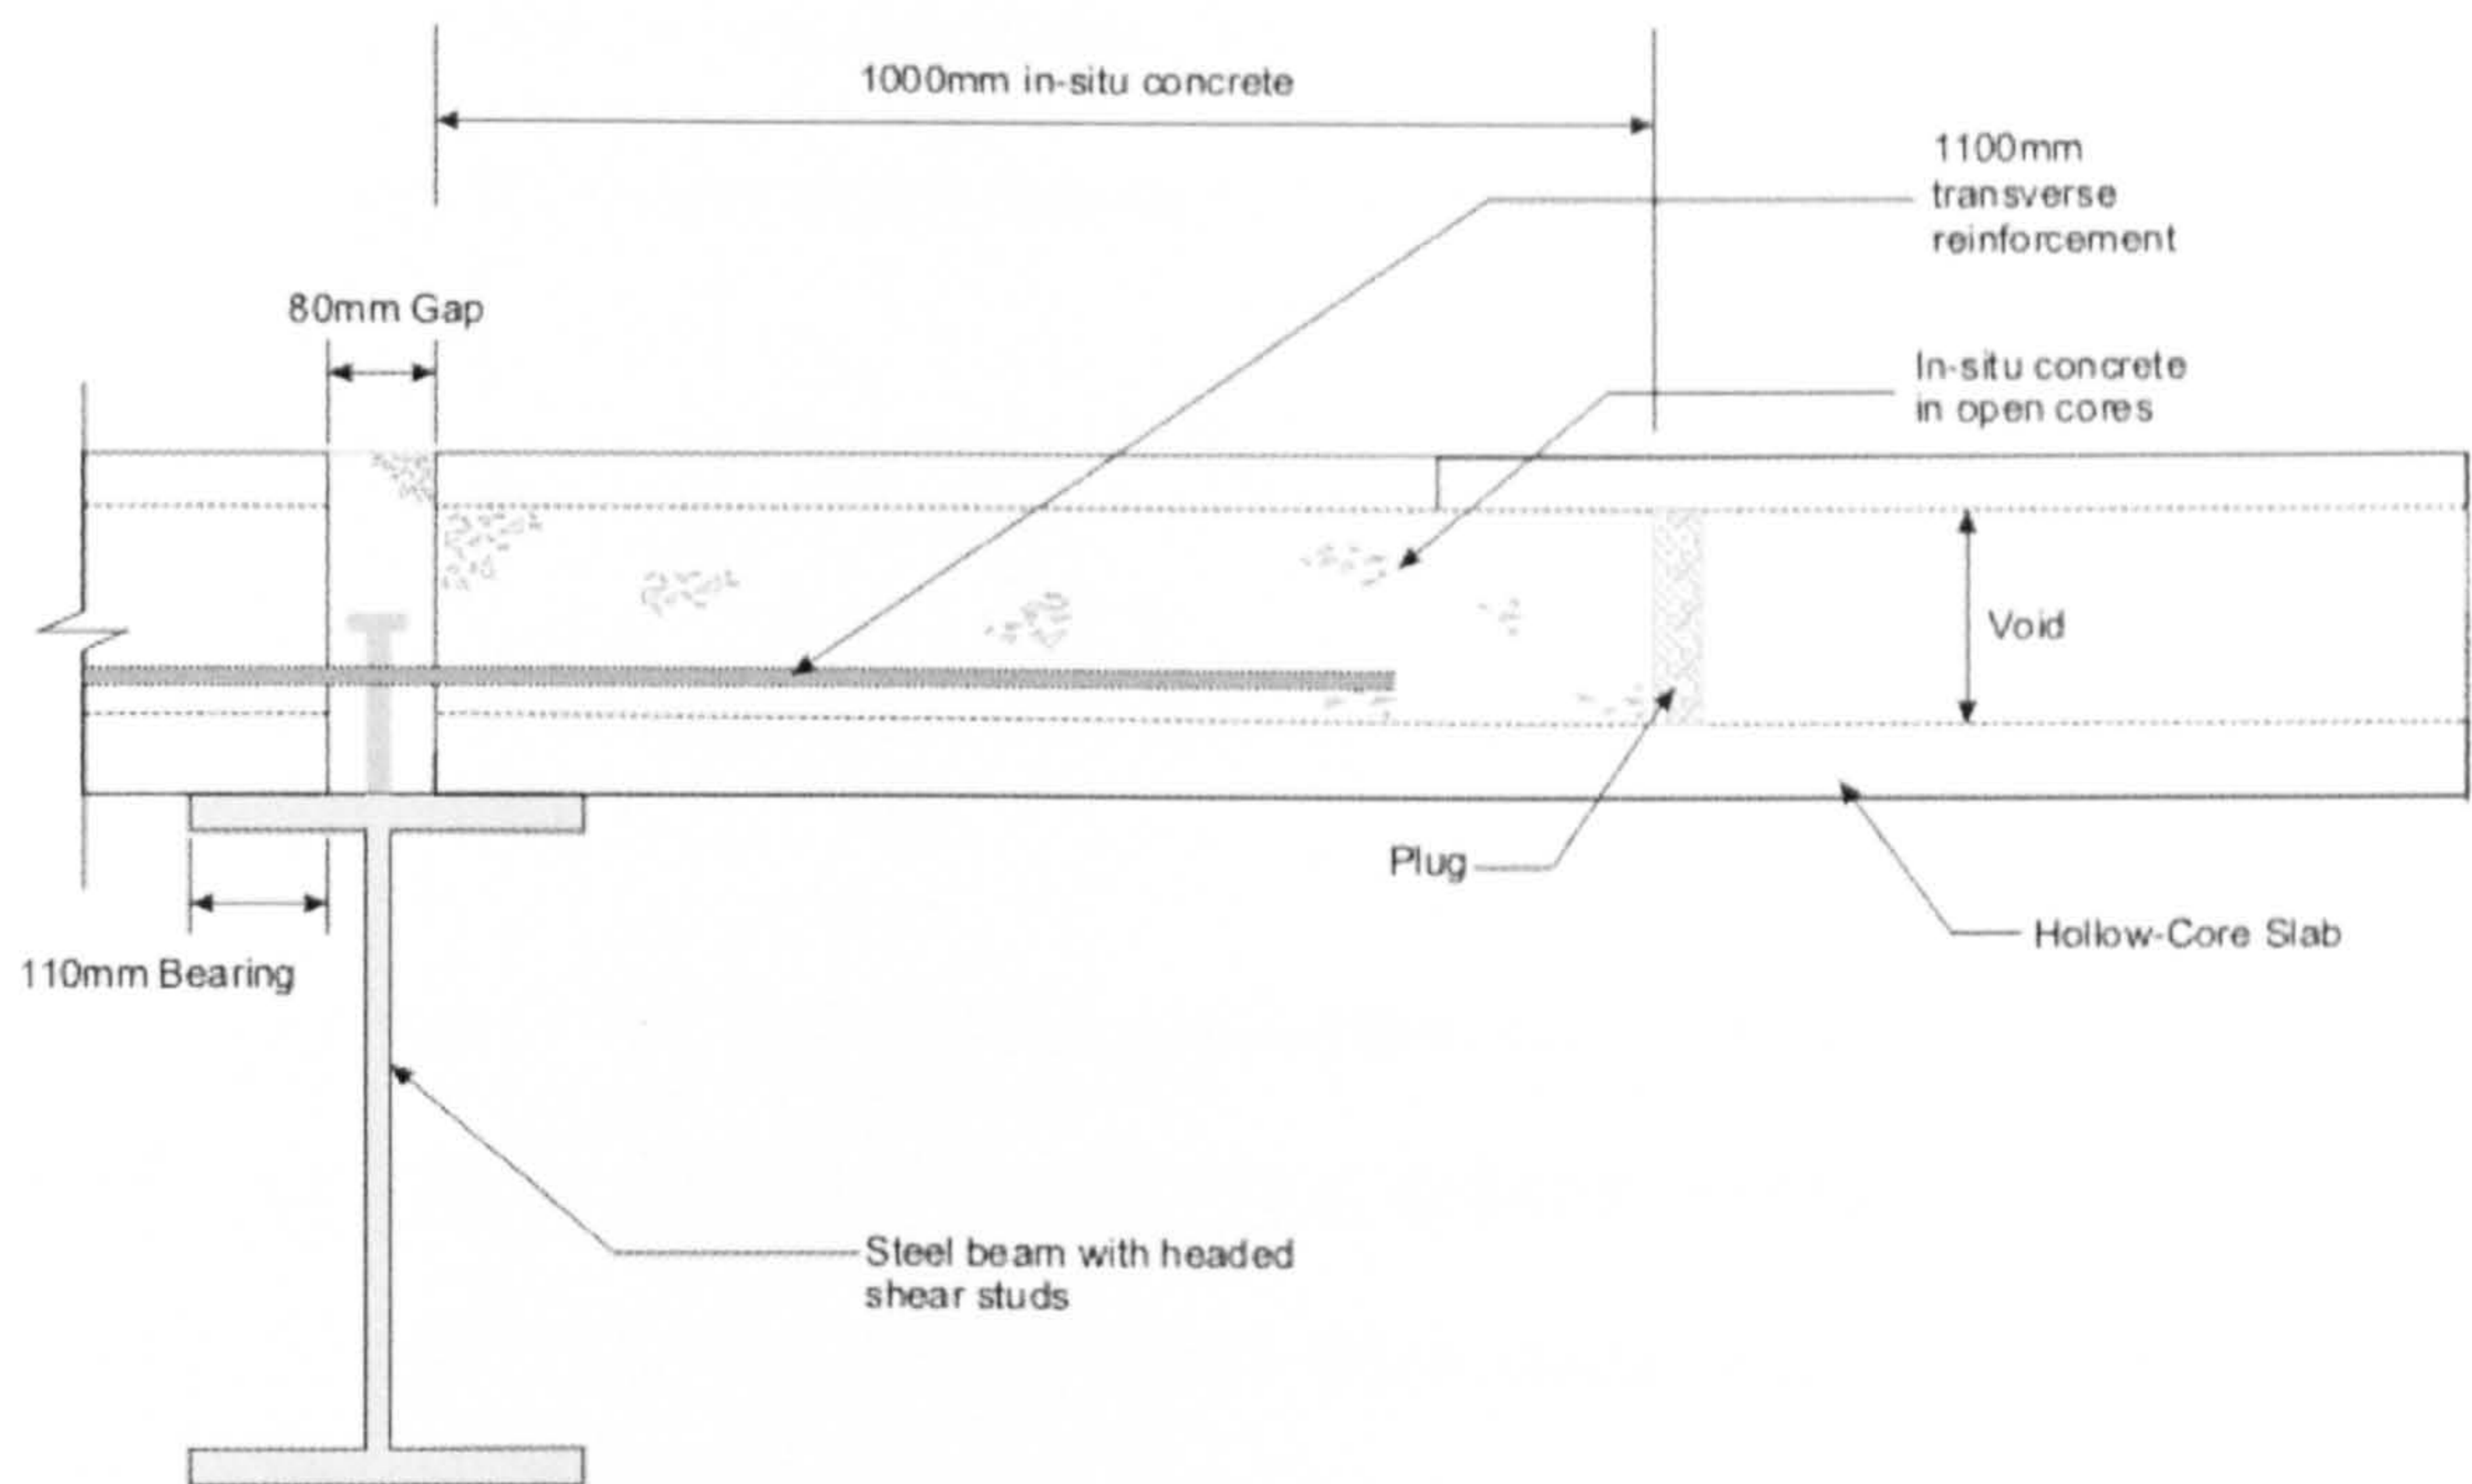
Cross-section of Beam with Precast Hollow-Core Slabs
